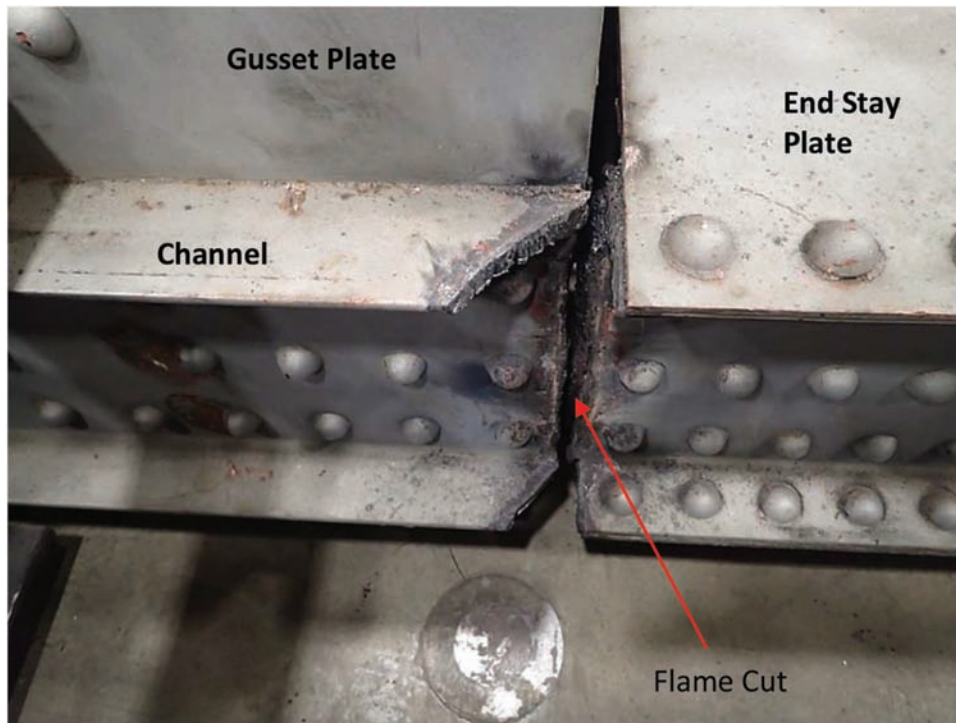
Cut at location “B” on Specimen 1 near the gusset plate (see Figure 5.1).
